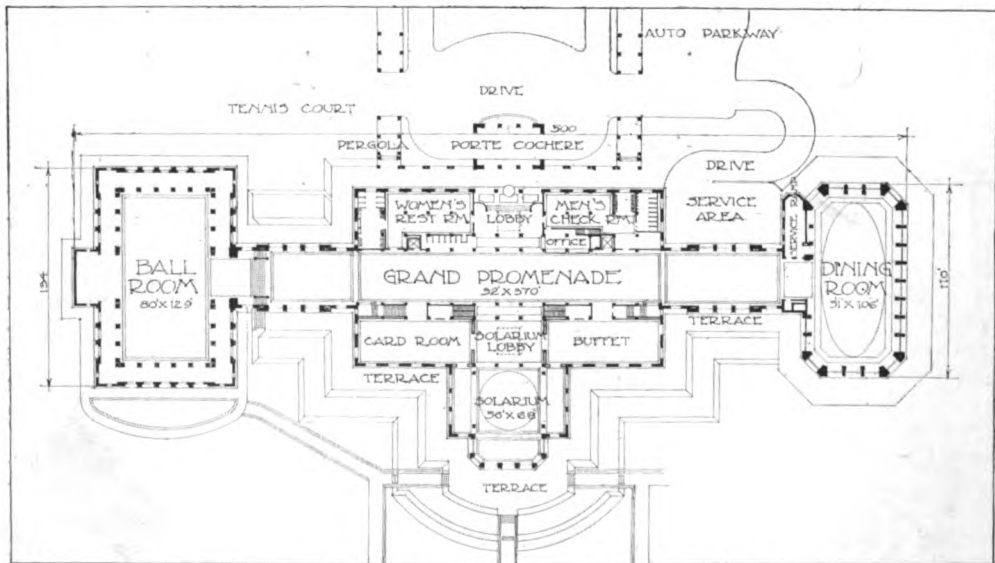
PLAN OF FIRST FLOOR—SOUTH SHORE COUNTRY CLUB, CHICAGO.
